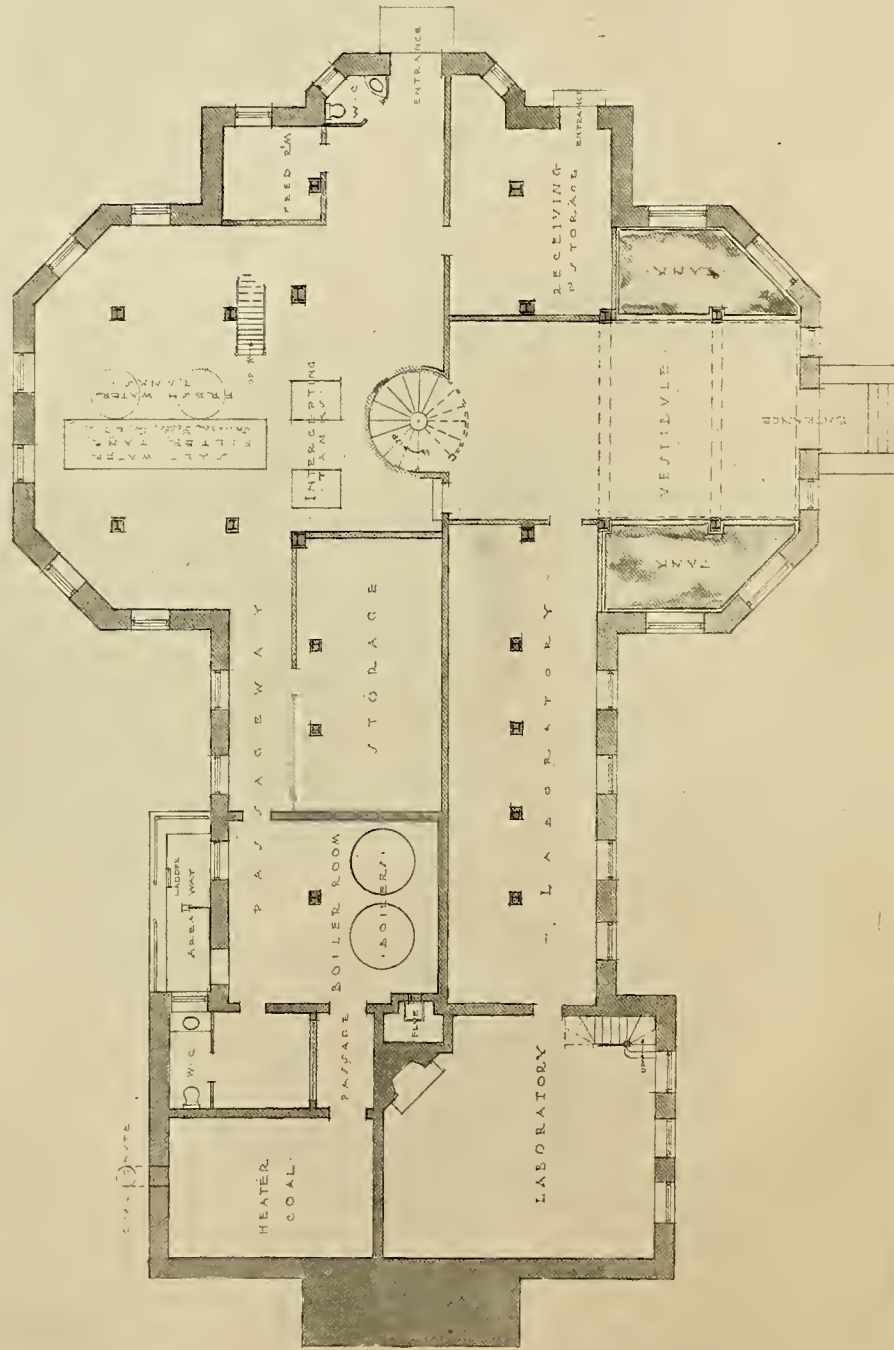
AQUARIUM, FIRST FLOOR PLAN.
